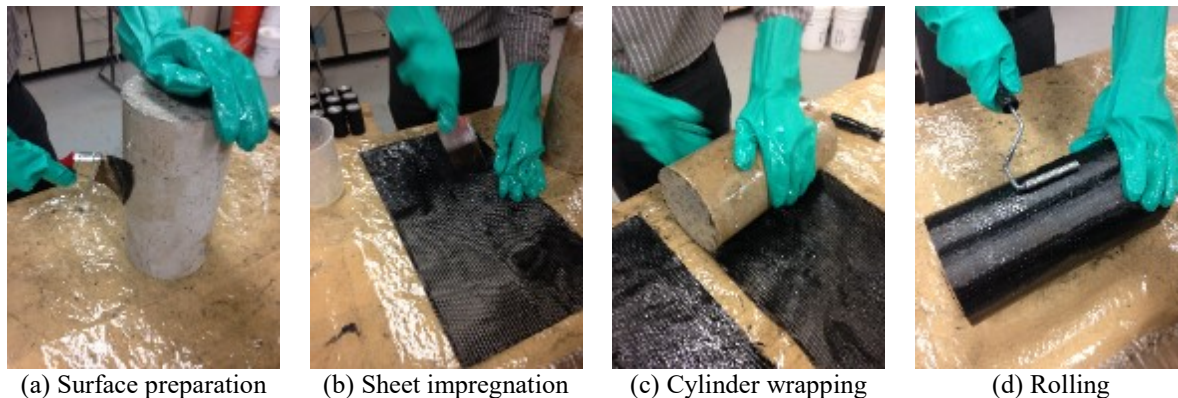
Step by Step Jacketing of Concrete Cylinders
